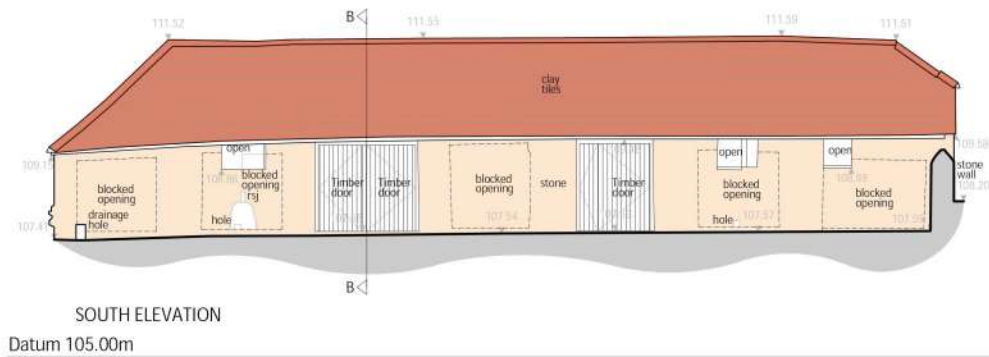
EXISTING BARN ELEVATIONS, (NTS)
